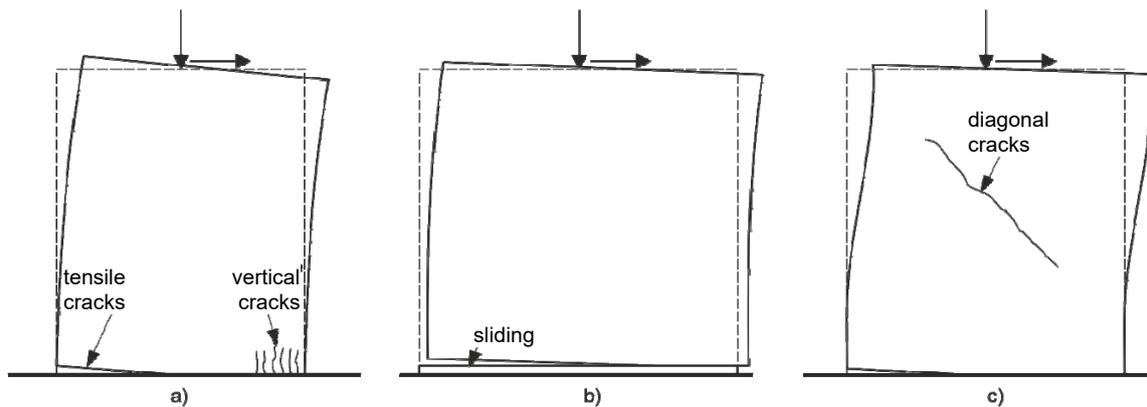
Typical modes of masonry panel failure [6]: a) uplift, b) shear sliding, c) diagonal cracking
